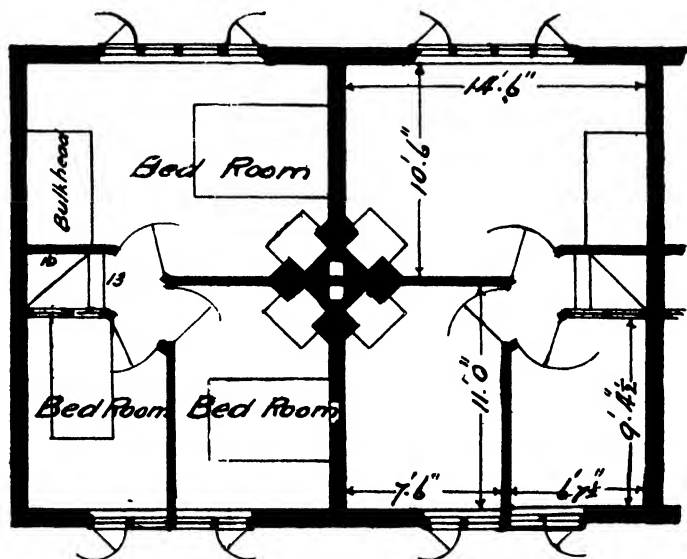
BEDROOM FLOOR OF FIG. 5.
